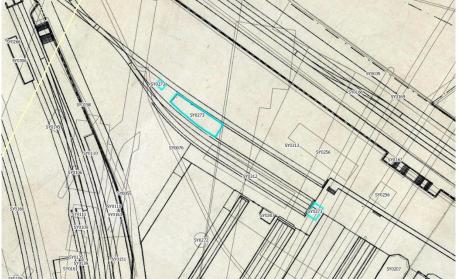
c.1896 plan showing larger structure has been modified to join new structures from the Station building. Source: SLNSW, FL16812178.
